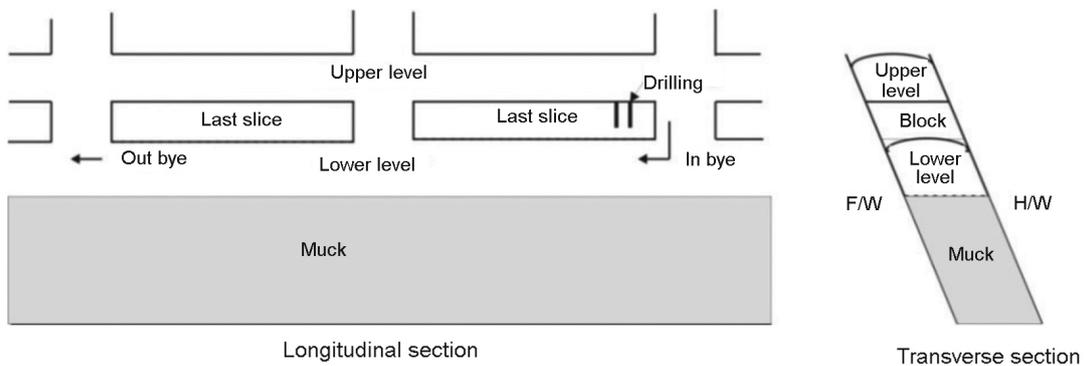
Longitudinal and transverse sections showing the last stage of stope with filling.
